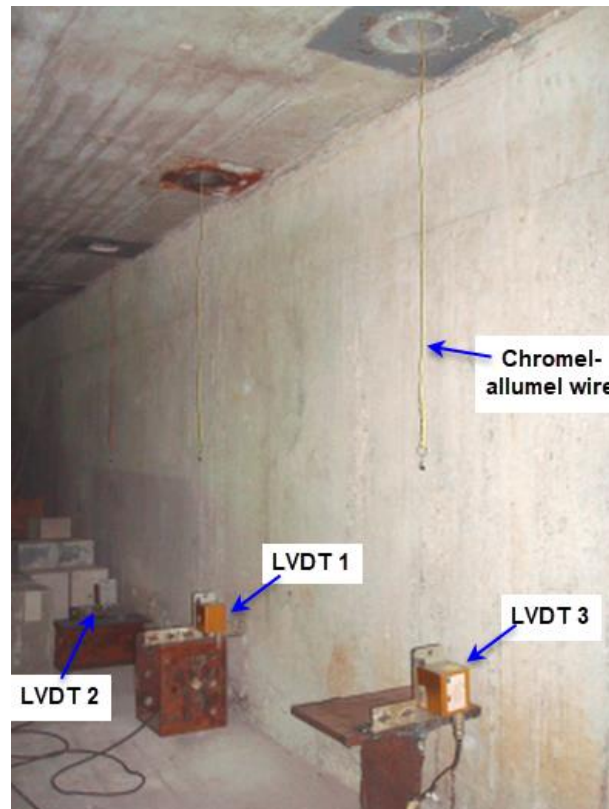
LVDTs placed in the Laboratory's basement floor (below the testing floor) to displacements measurements of the beams
